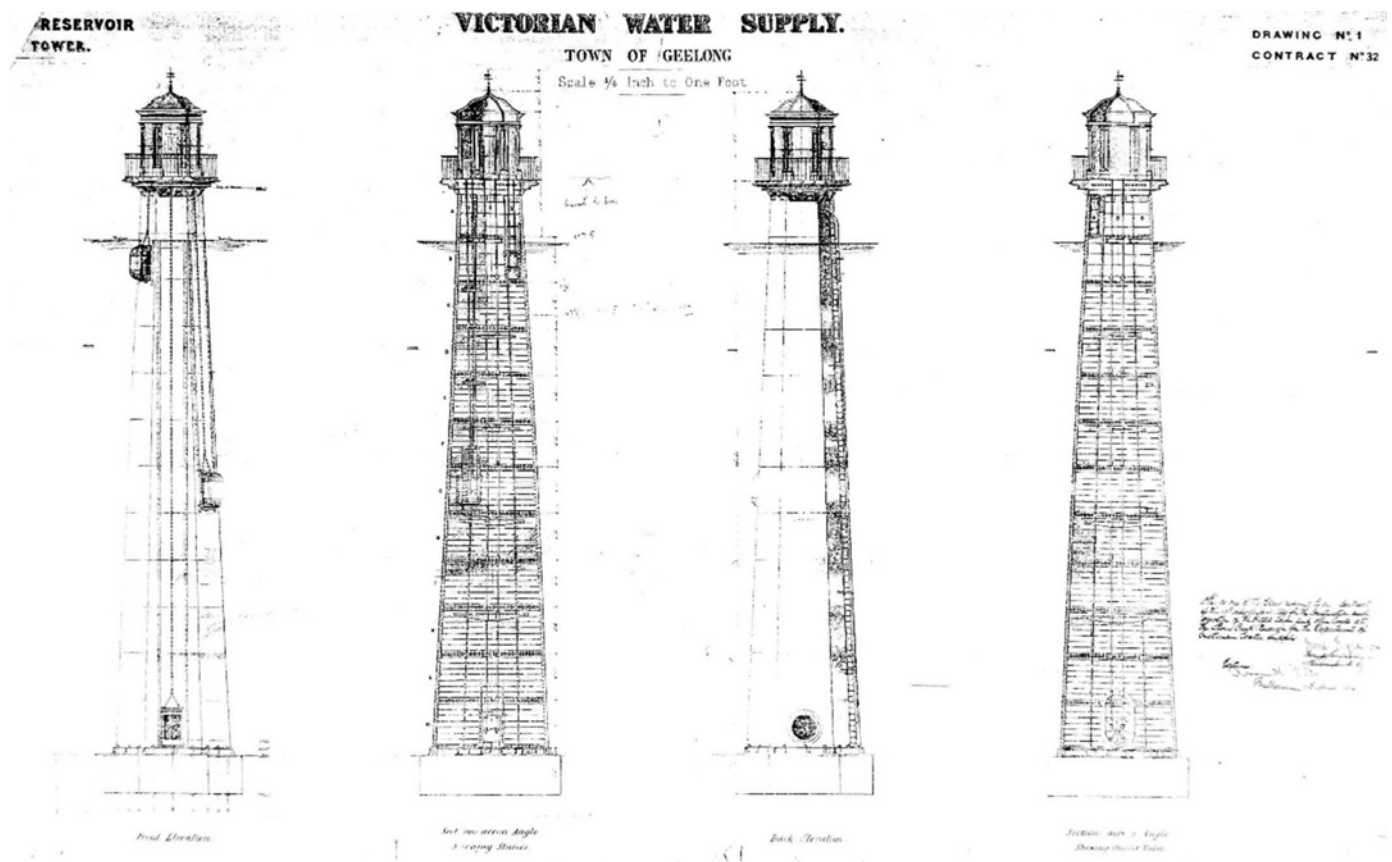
Victorian Water Supply, Town of Geelong, Elevation & Section Drawings of proposed Reservoir Tower, n.d. [c.1869]. Source: Barwon Water.
